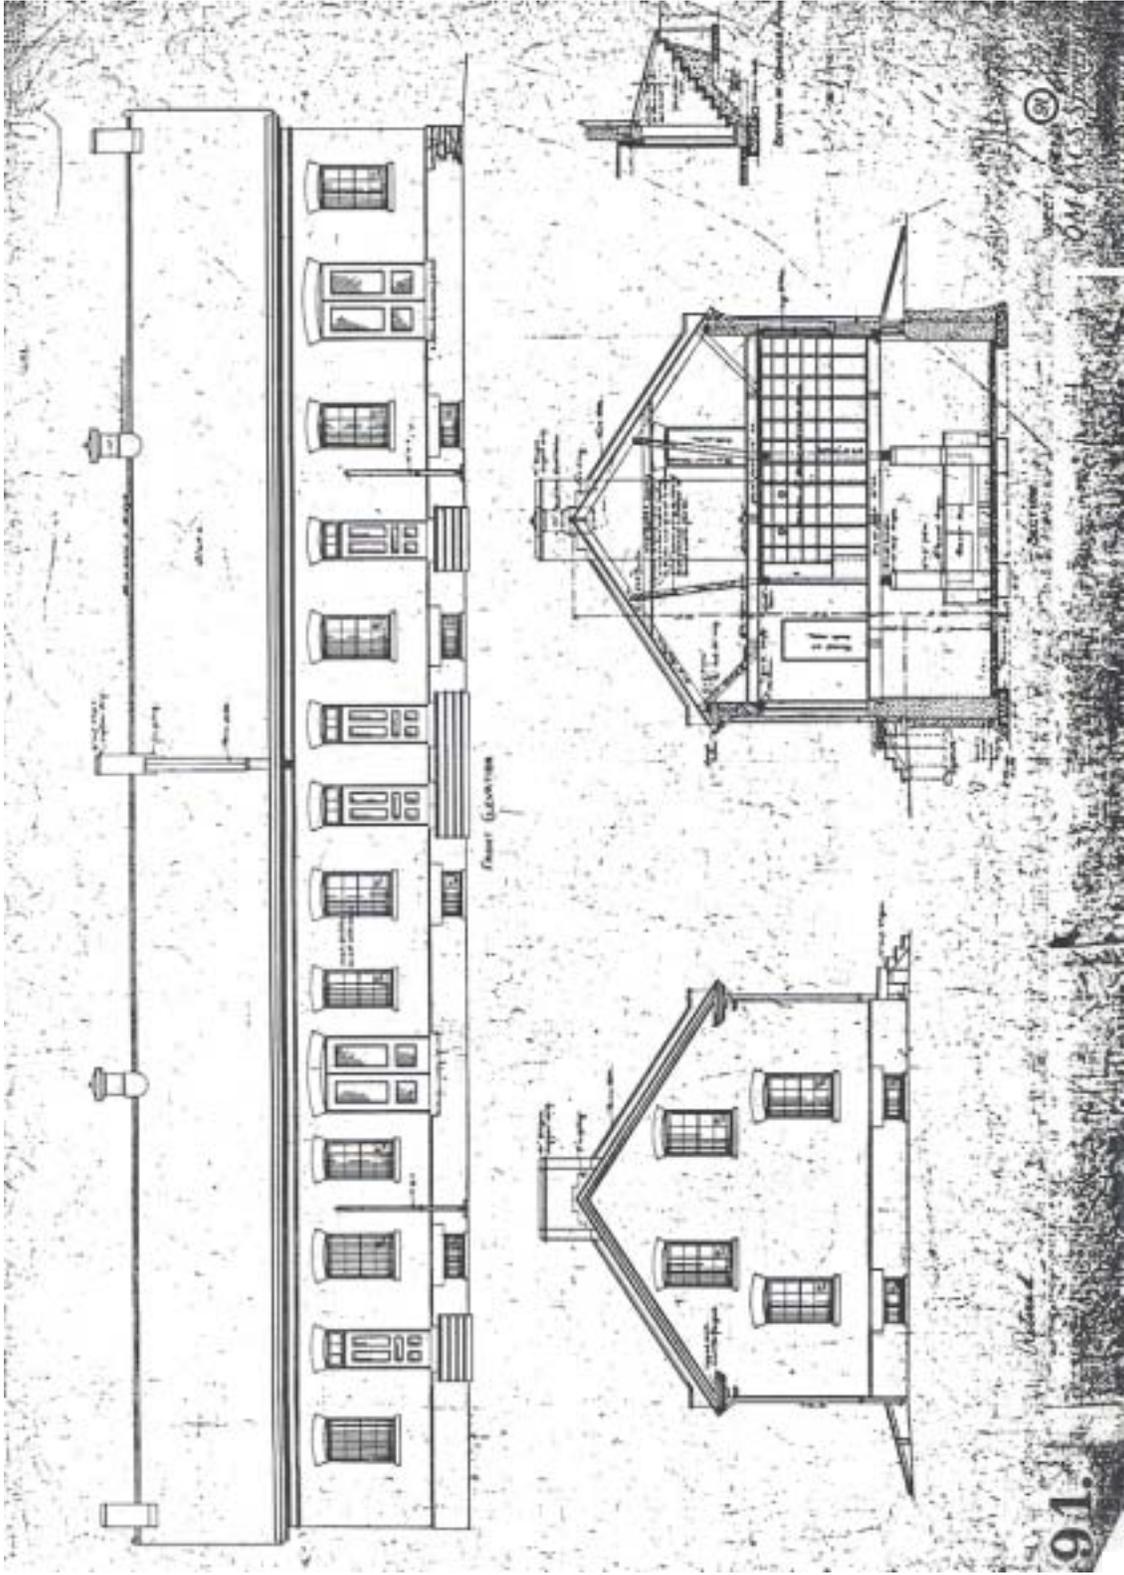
Elevation and section, Quarters Storehouse, Plan no. 91, June 1894 [sheet 1 of 4].
